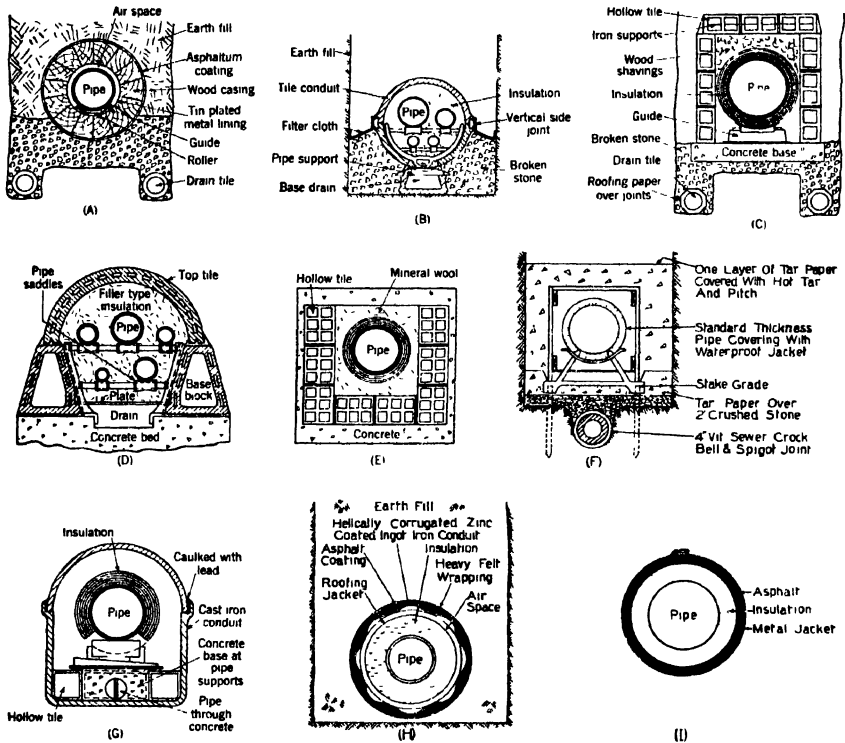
CONSTRUCTION DETAILS OF CONDUITS COMMONLY USED
